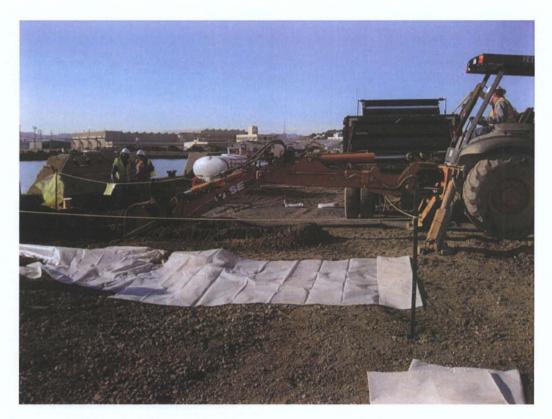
Building 383 demolition, facing west—December 21, 2010
